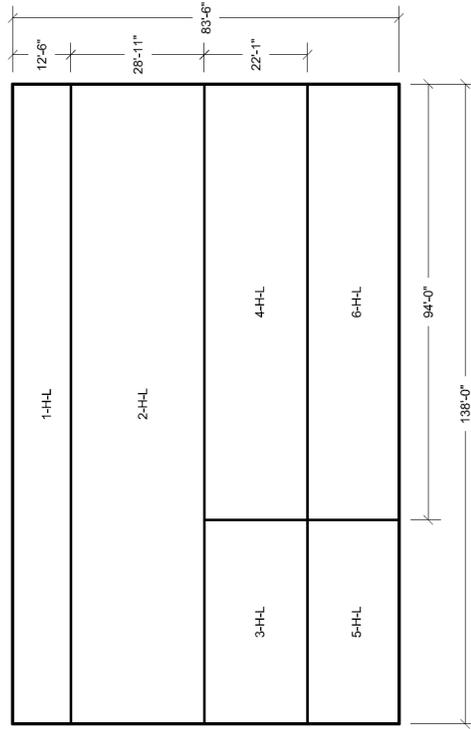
H.6.96: LHS BASIN EAST WALL LOOKING WEST
